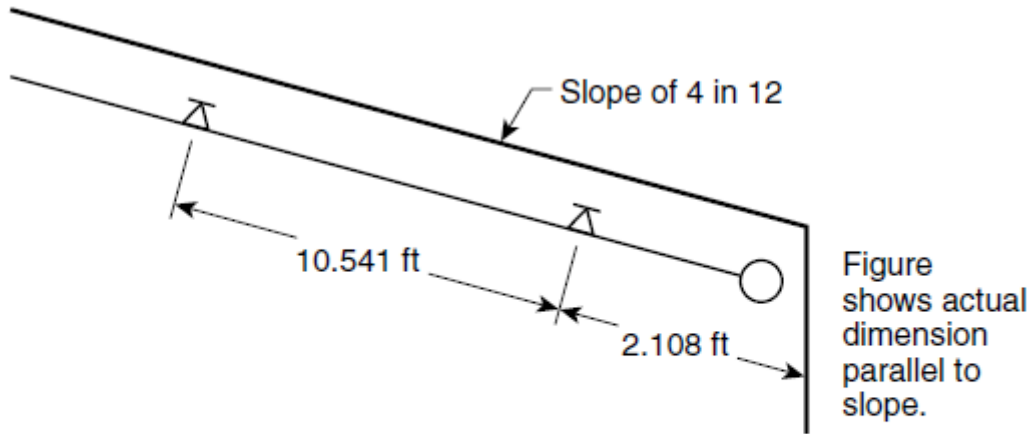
Sprinkler Spacing.
